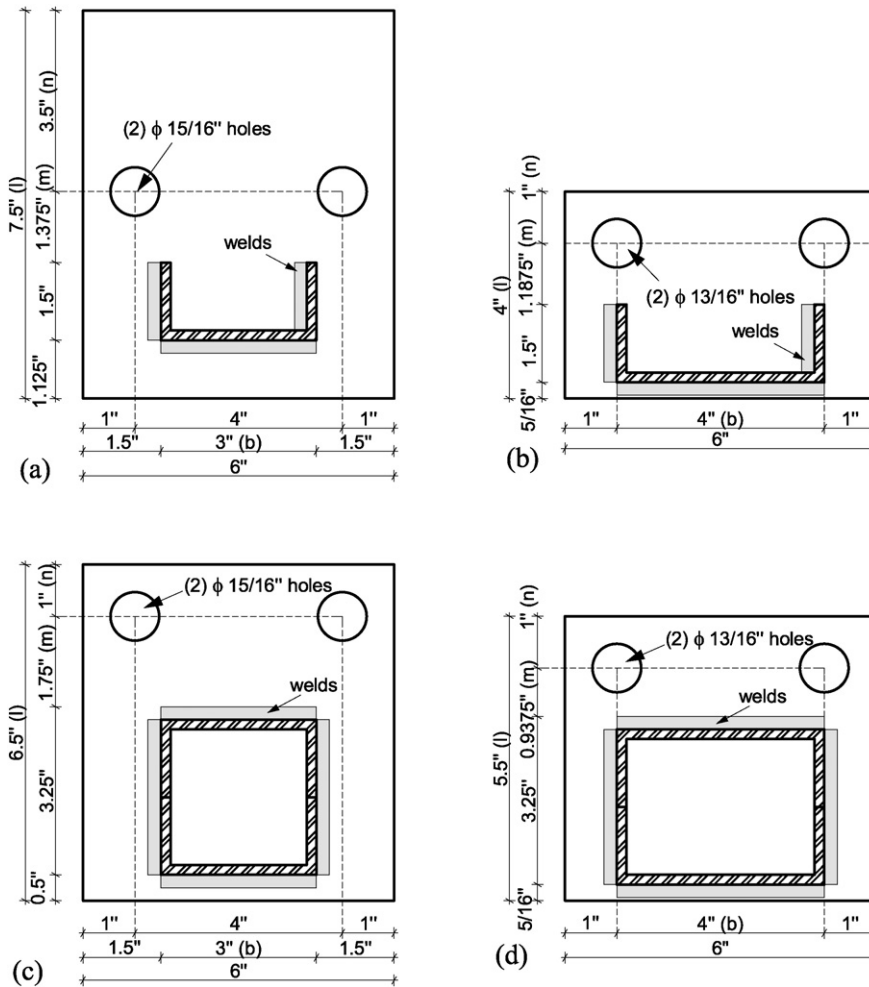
Plan dimensions of the various base plate details; a-d reflect layouts A–D.
